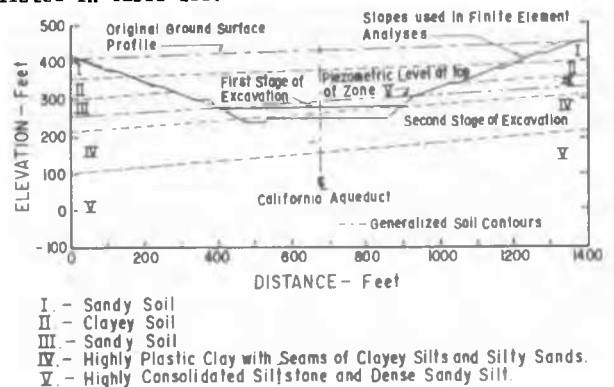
Generalized Soil Profile at the Site of the Excavation for the Buena Vista Pumping Plant (Chang and Duncan, 1969).
